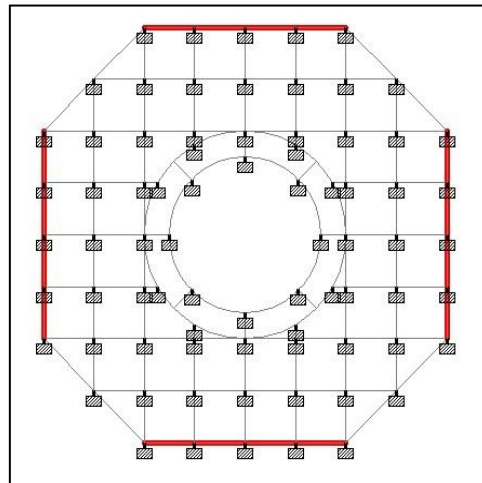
(d). Model 4- building with shear wall on opposite sides excluding chamfered portion
